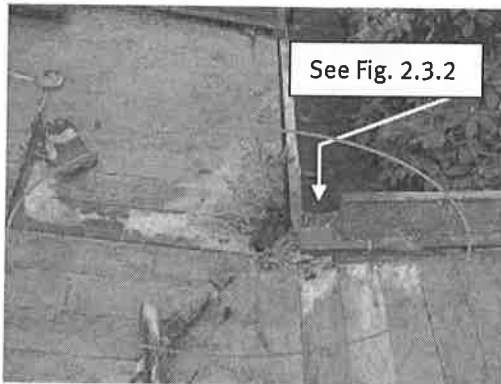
Northwest Corner of Sloped Roof at Drain Location (Above Fig. 1.19)
